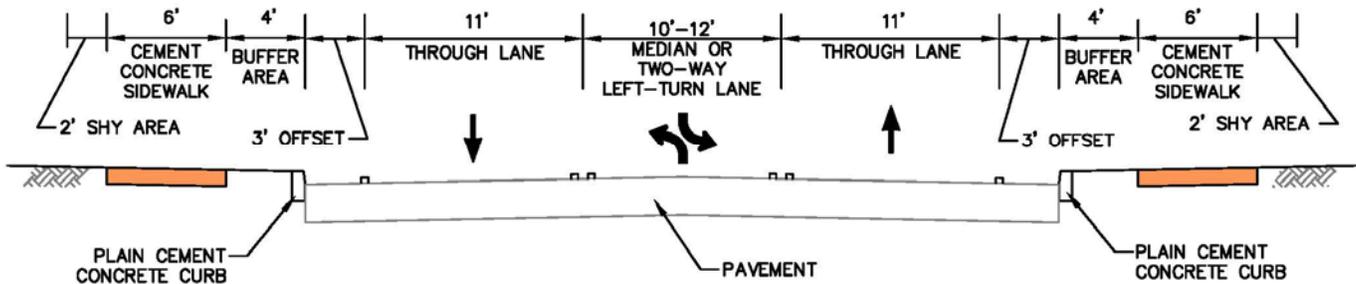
Desirable Typical Section for Pottstown Pike (between Park Road/Station Boulevard and Ticonderoga Boulevard)
